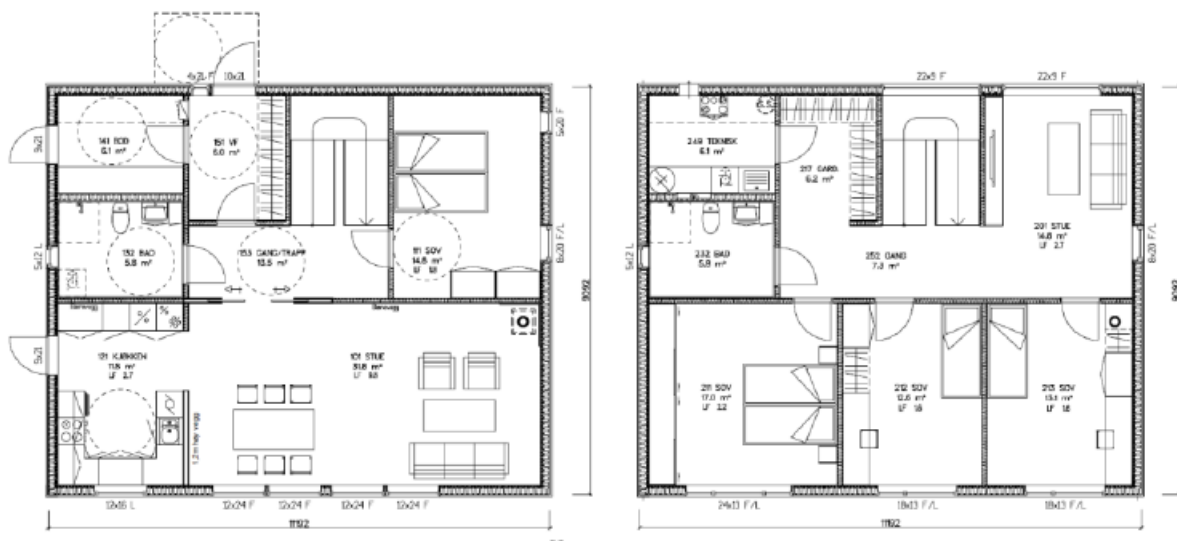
Floor plan of detached house in Australia (Fay, 1999)
